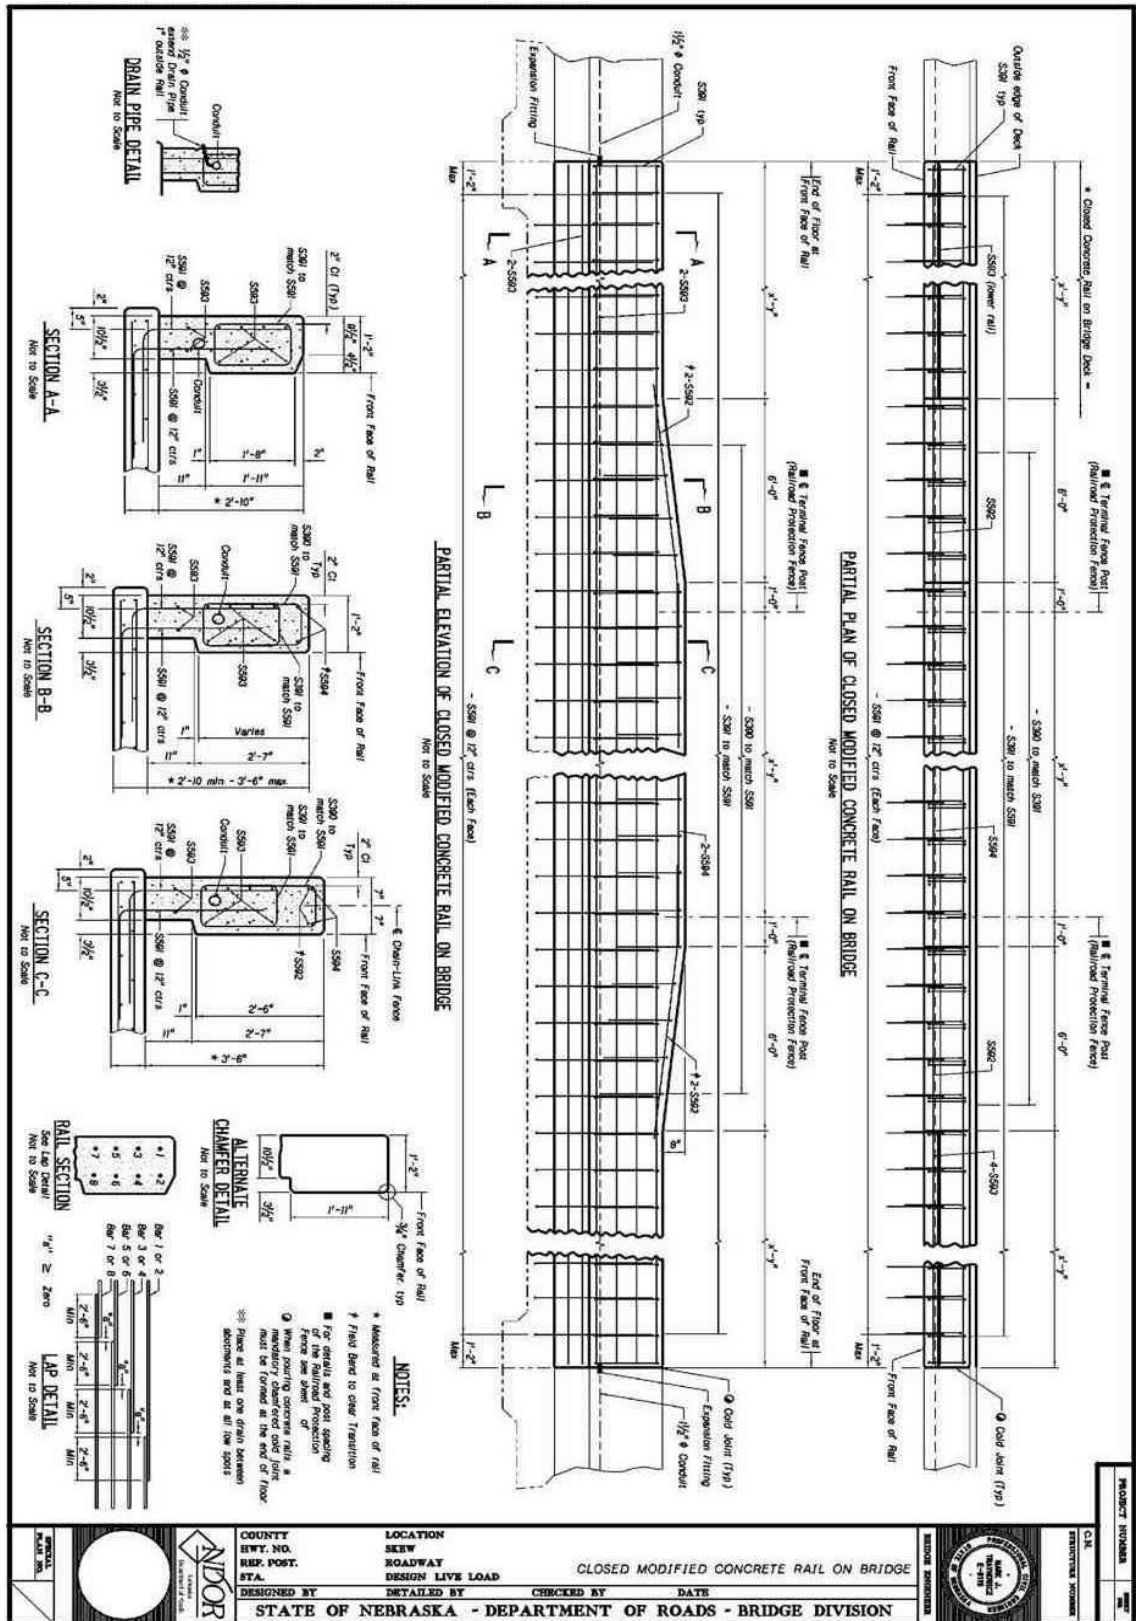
Nebraska Closed Concrete Rail Bridge Deck [11]
